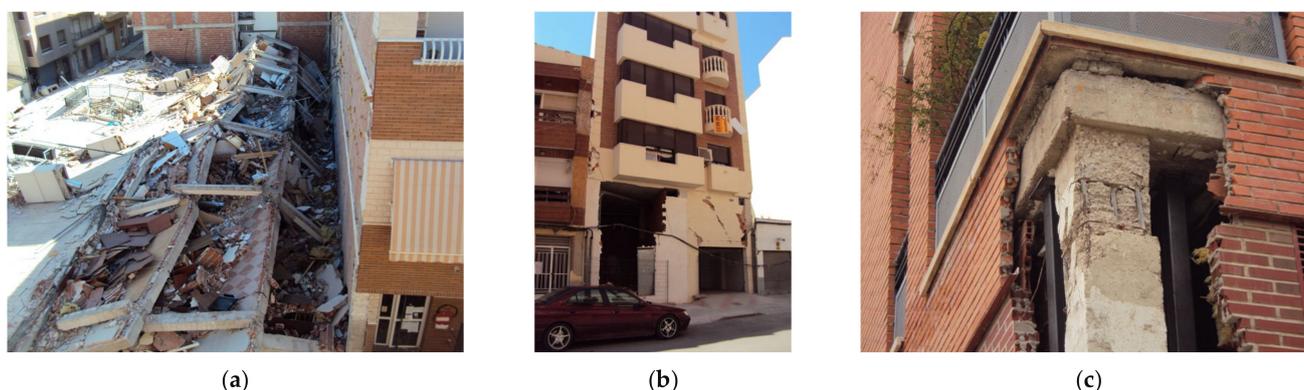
Lorca, Spain—2011: (a) building collapse after the earthquake; (b) building with a soft-storey mechanism; (c) column failure due to inadequate detailing of the transverse reinforcement.
